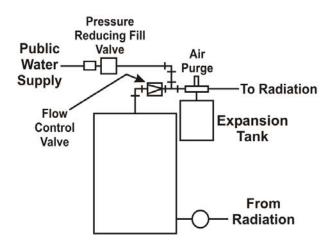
Pressure regulating valve and backflow prevention valve configuration
